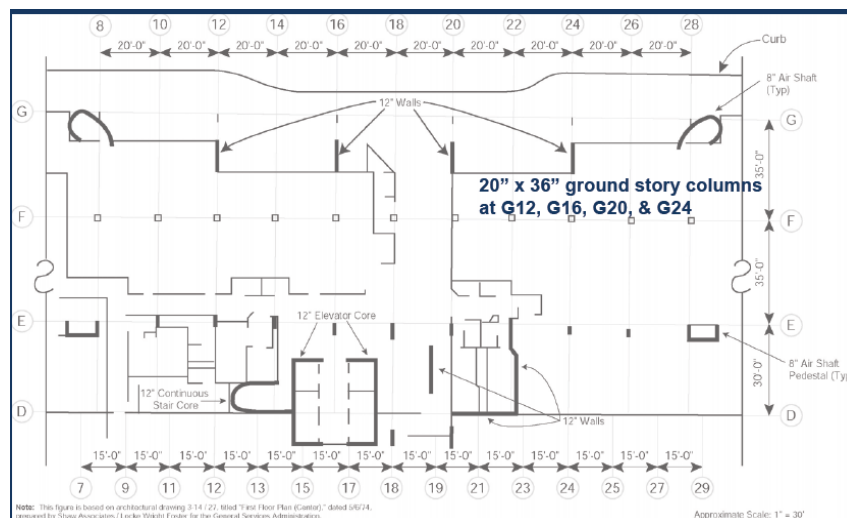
First Floor Plan (FEMA 277, 1996)
